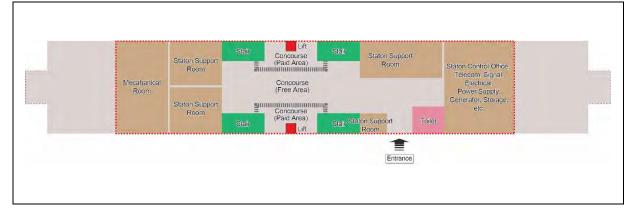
Prototype Station Building Plan of Elevated Type Medium Station
